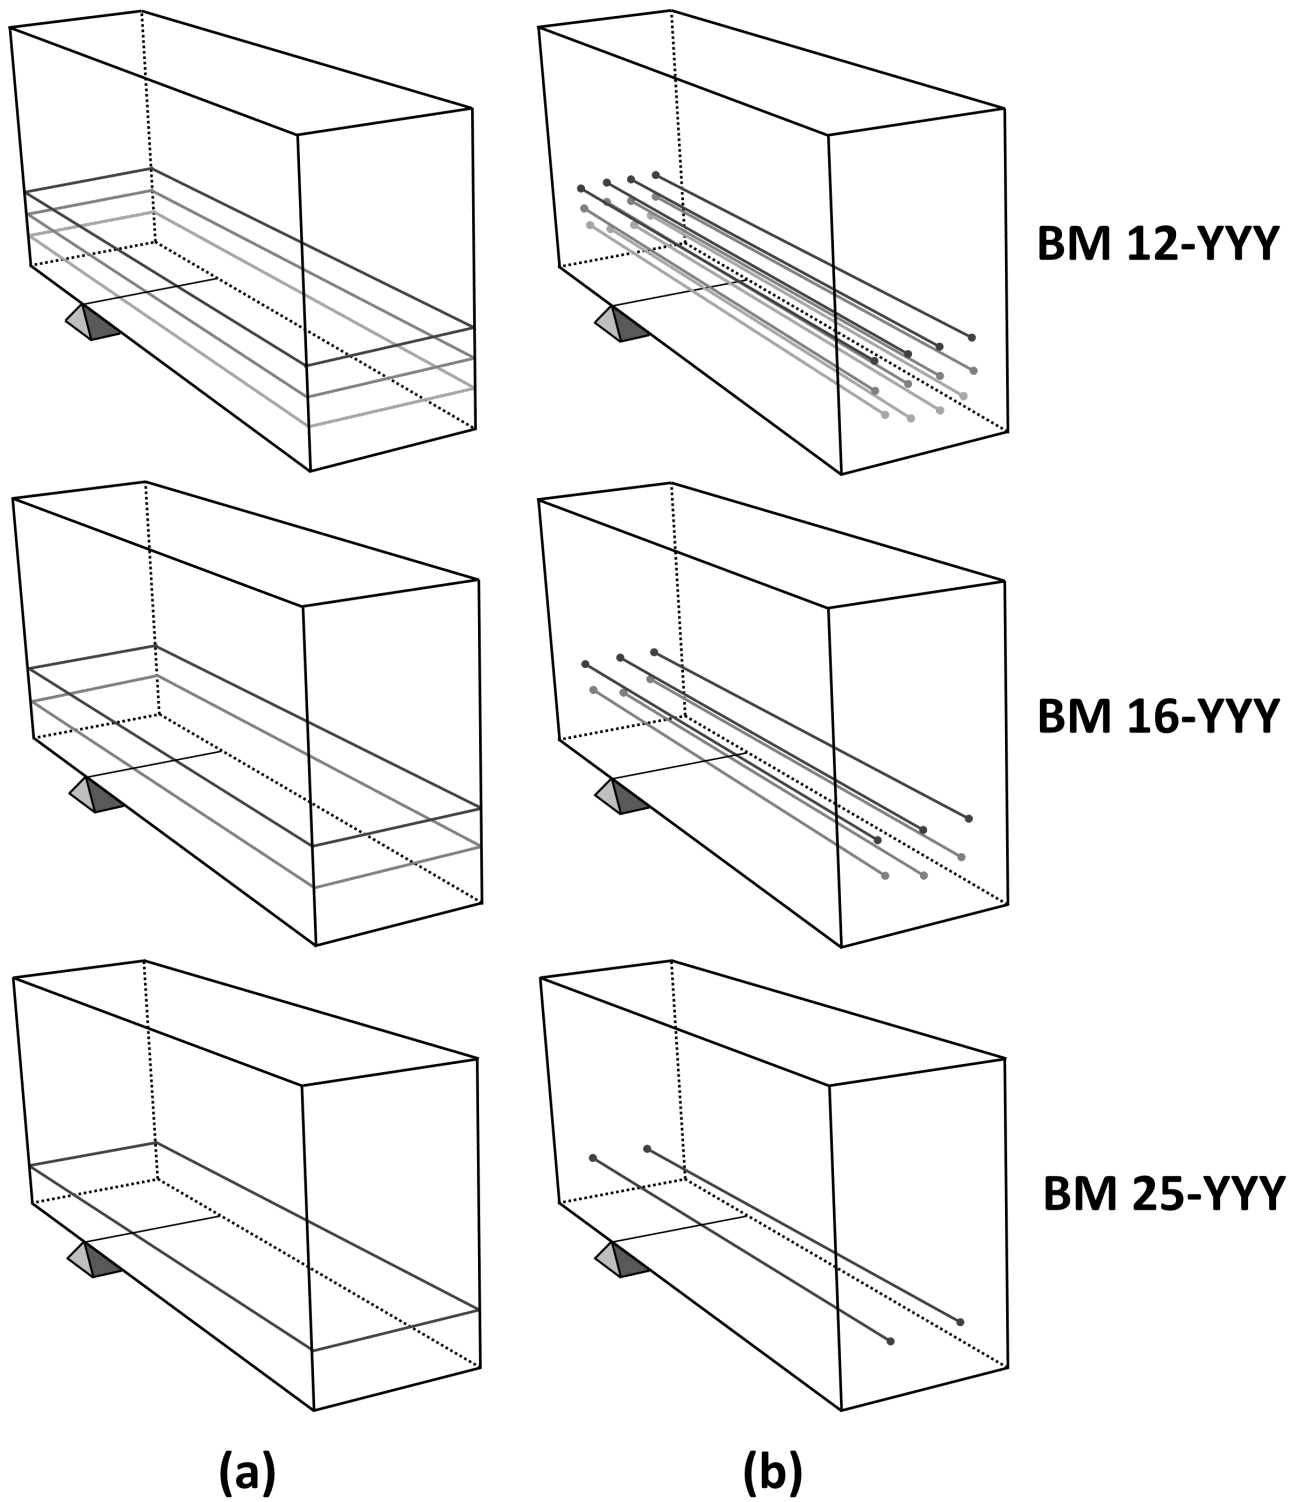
Modelling of Longitudinal Reinforcement: (a) Membrane Sections (b) Truss Sections
